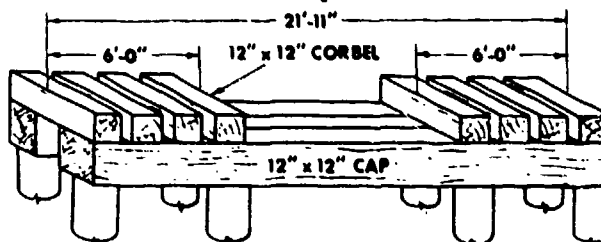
Construction of pile caps to provide seating for bearings at adjacent ends of independent spans-wood pile, or trestle and cap.
